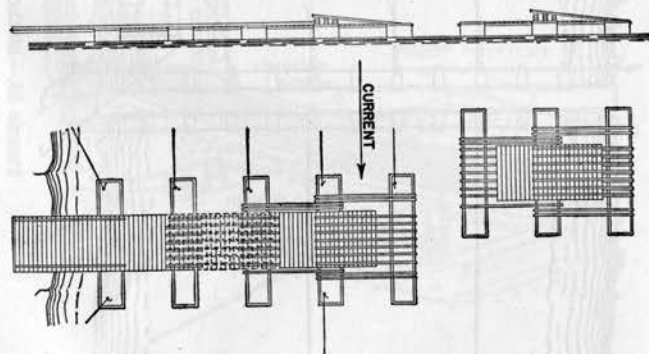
Method of construction by parts. (First bay may be a trestle bay instead of as shown.)
